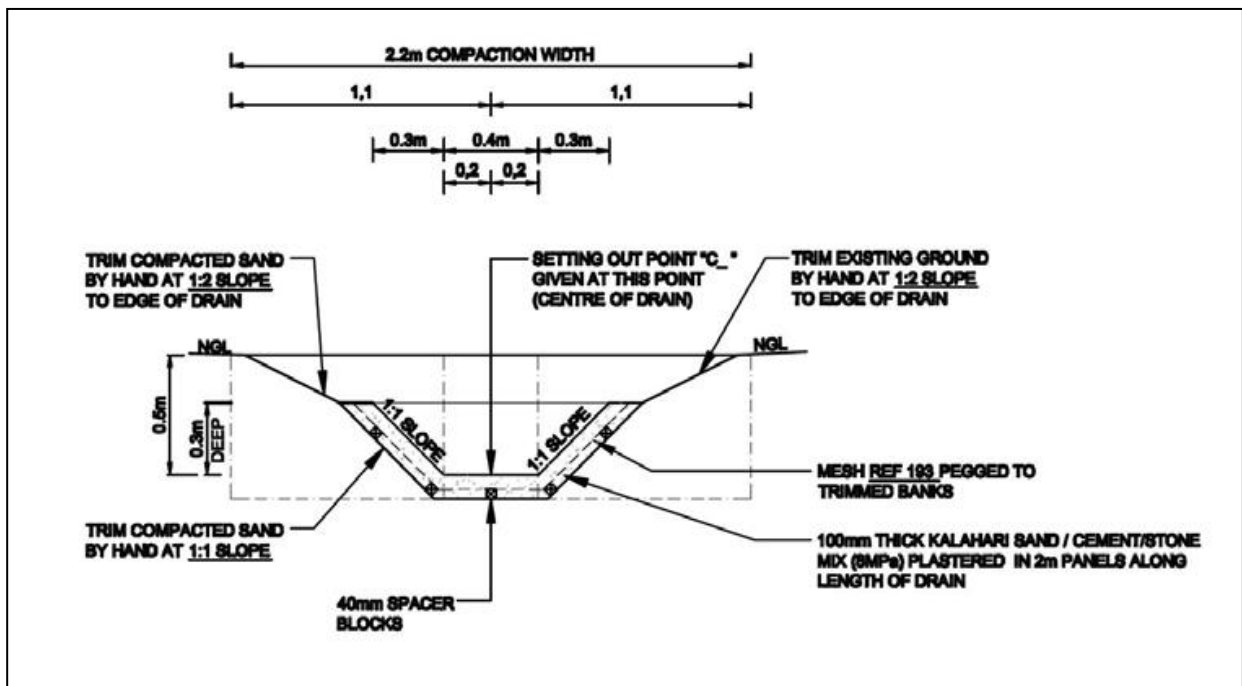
TYPICAL DESIGN OF A TRAPEZOIDAL DRAIN
